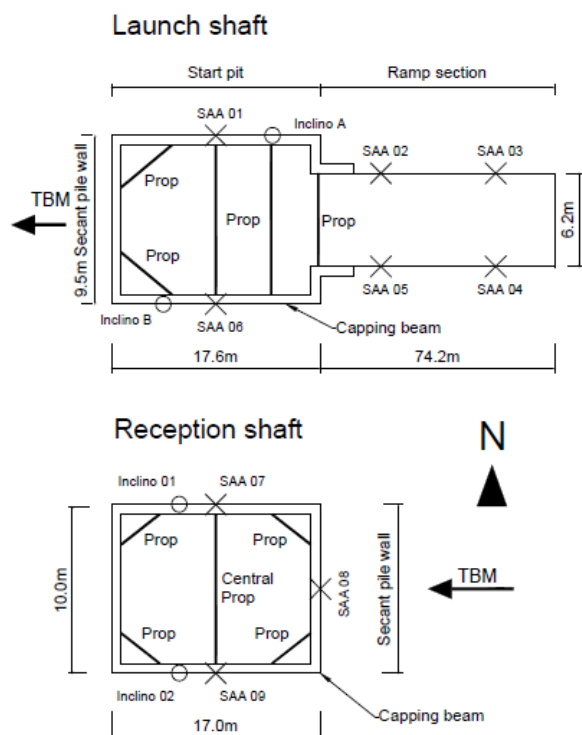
Plan views of launch and reception shafts, which are located at Aughose and Glengad sites, respectively.
